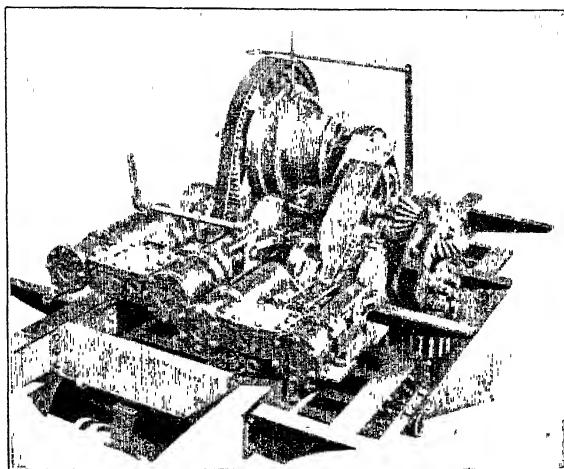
Details of Thew Hoisting Engine—Horizontal Double Reversing Type
